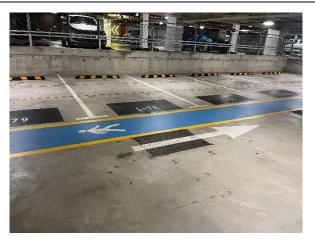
Lower Ground, adjacent parking bay L-78, Unknown Pit
